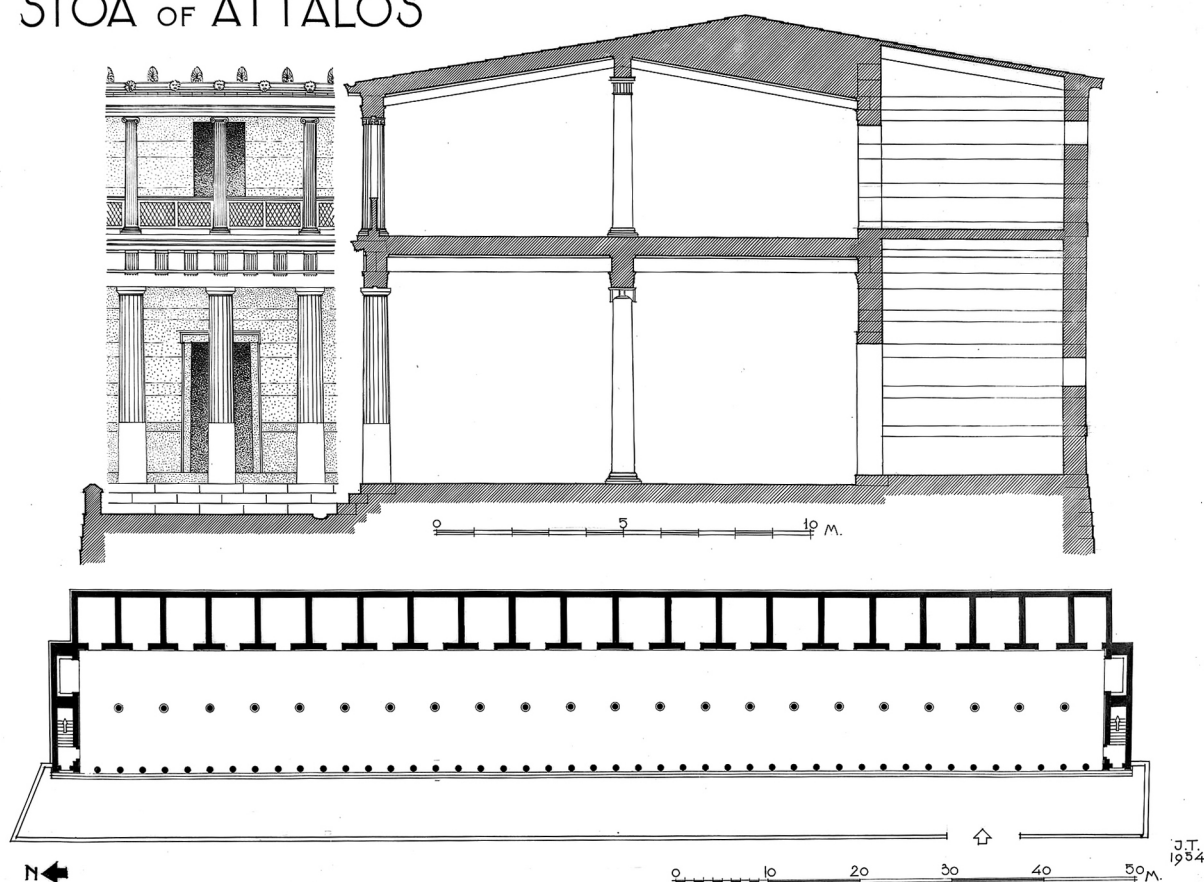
Plan, elevation, and section of the Stoa of Attalos II (ASCSA, Agora Excavations. Drawing by John Travlos, 1954).
